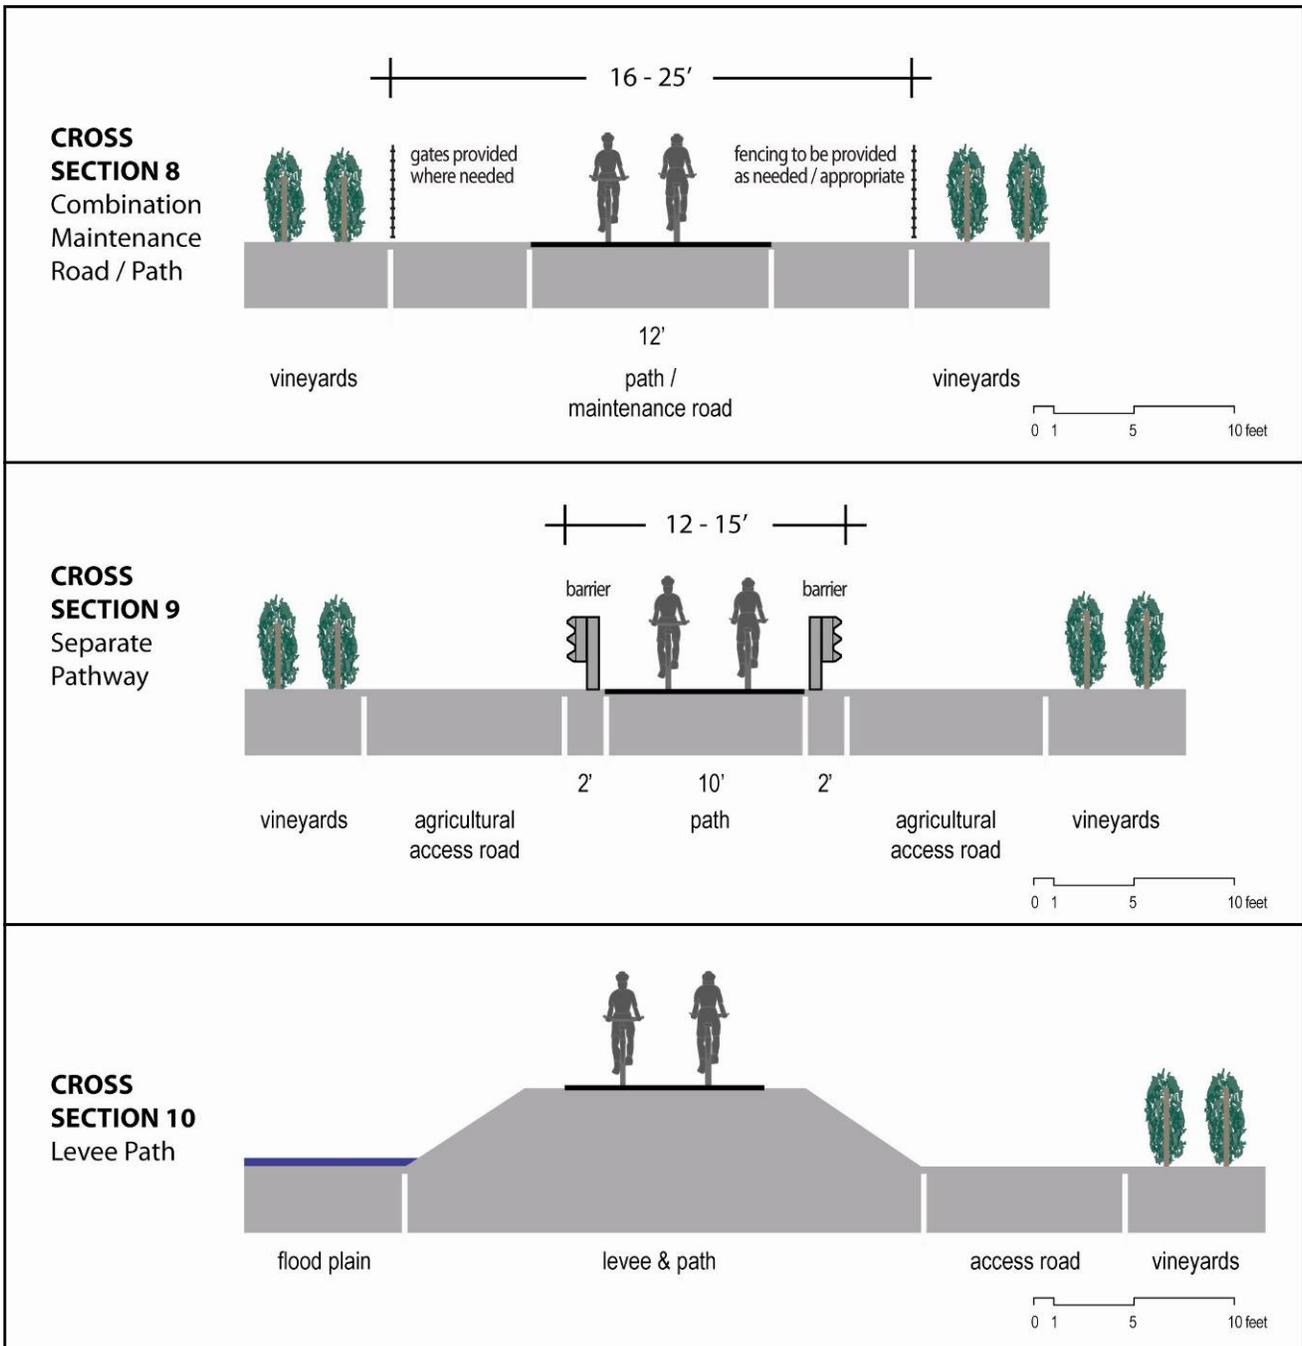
Typical Greenway Cross Sections: Separate Pathways
